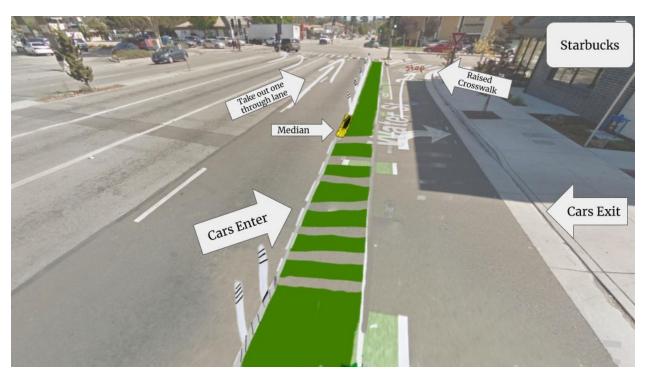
Detailed design for the right turn lane and bike lane mixing zone at the Water Street and Ocean Street intersection.
